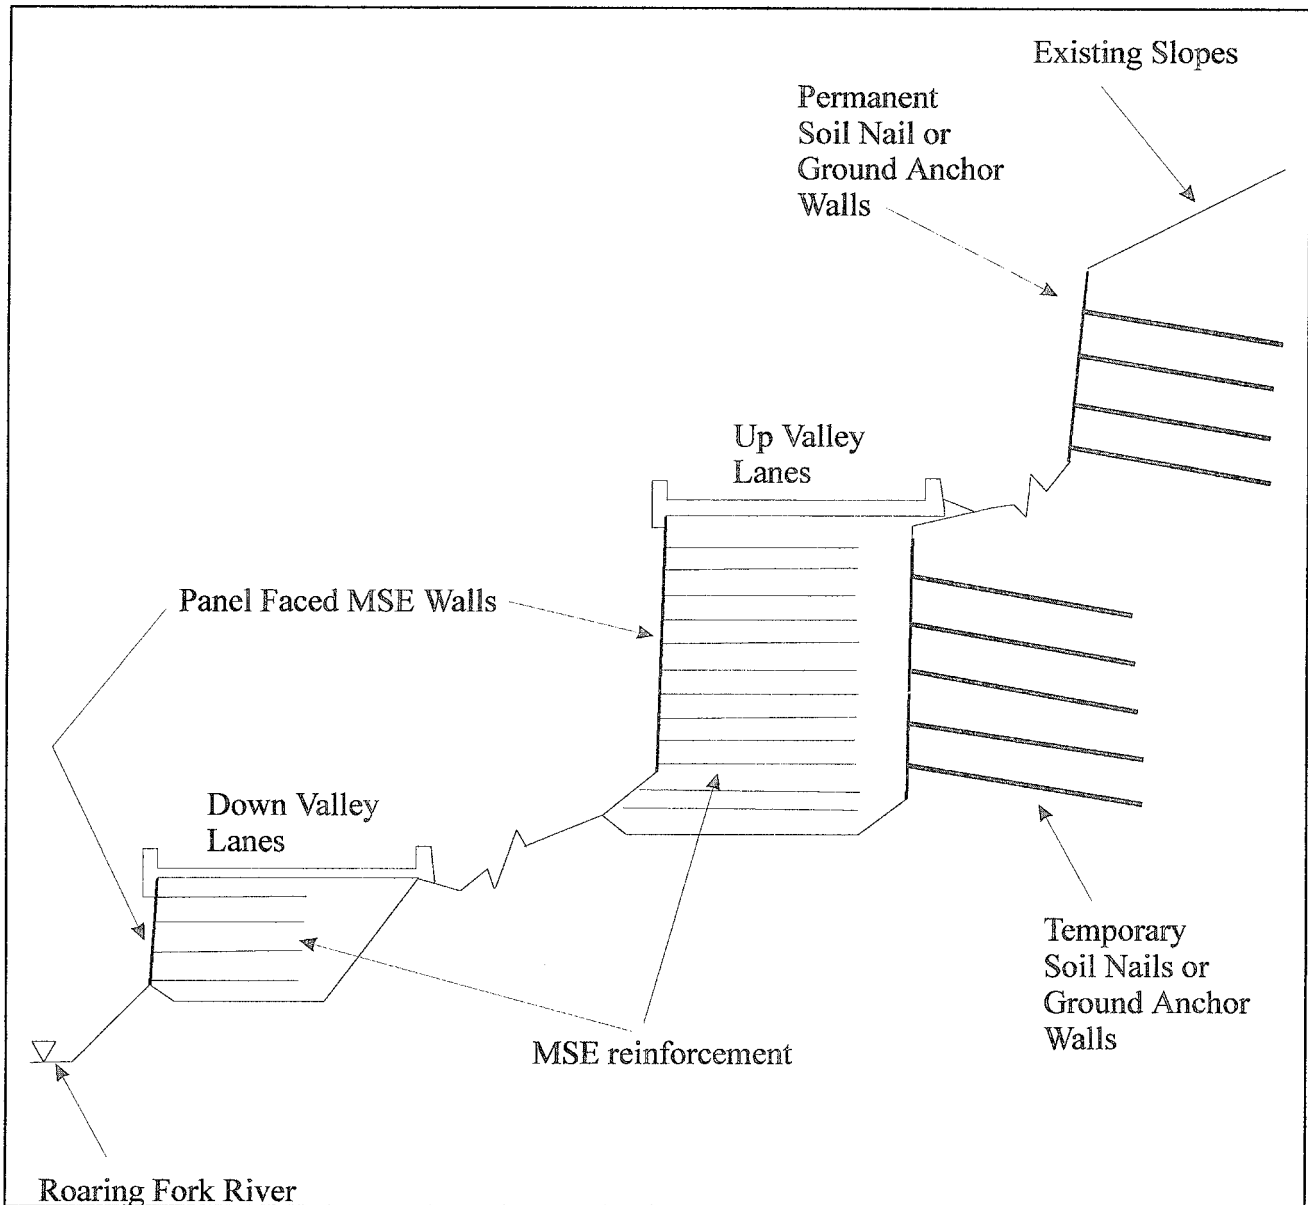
Generalized Profile of Retaining Wall System for the Project
